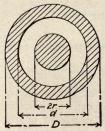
Cross-Section Showing Neutral Core in Chimney.
